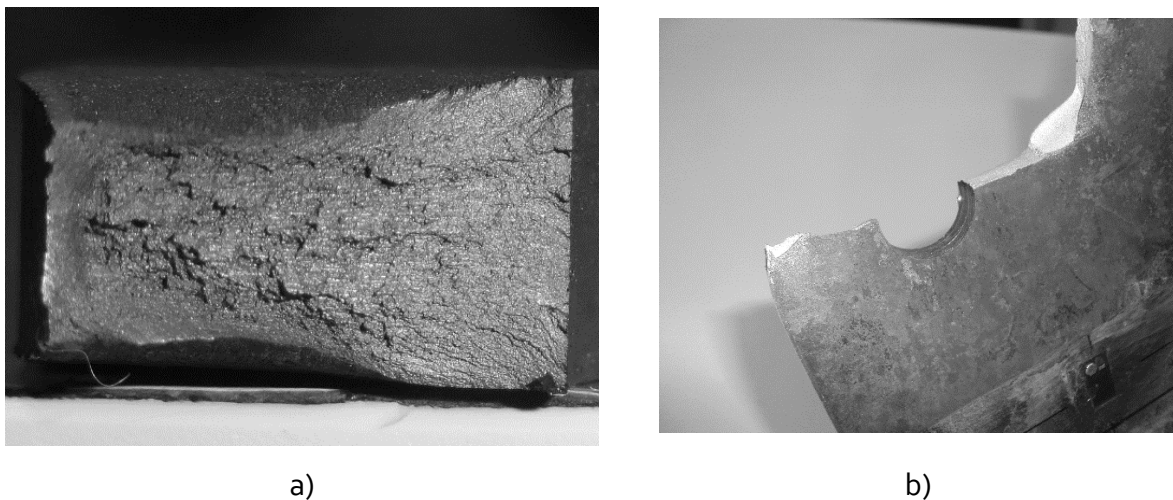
Typical failure surfaces of riveted tested series: a) R2 series; b) R3 series.
